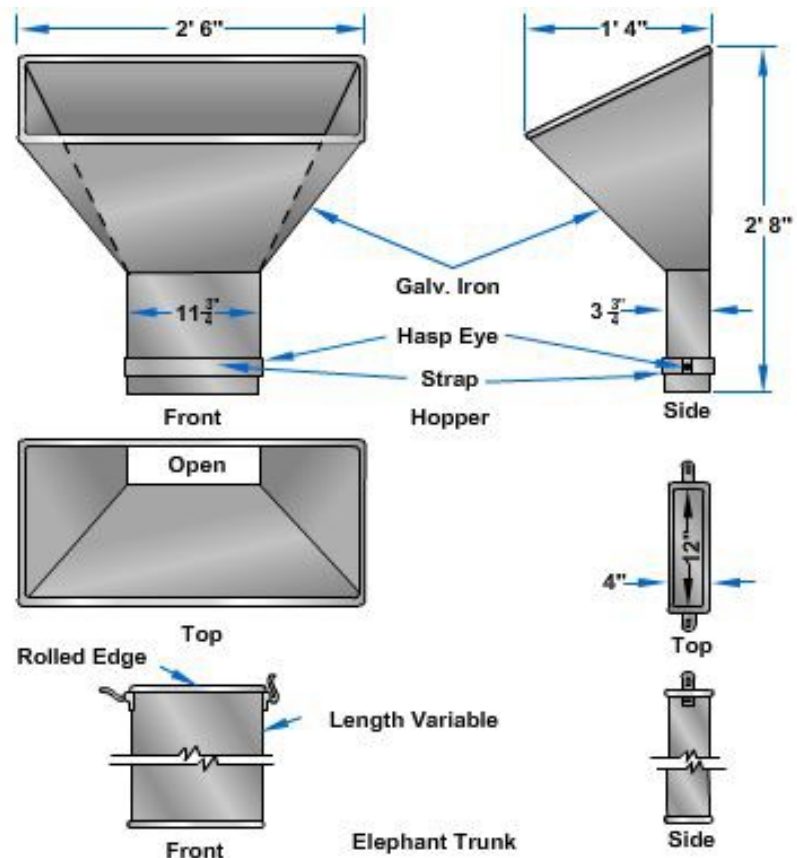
Chute, or down pipe, used to check free fall of concrete.
